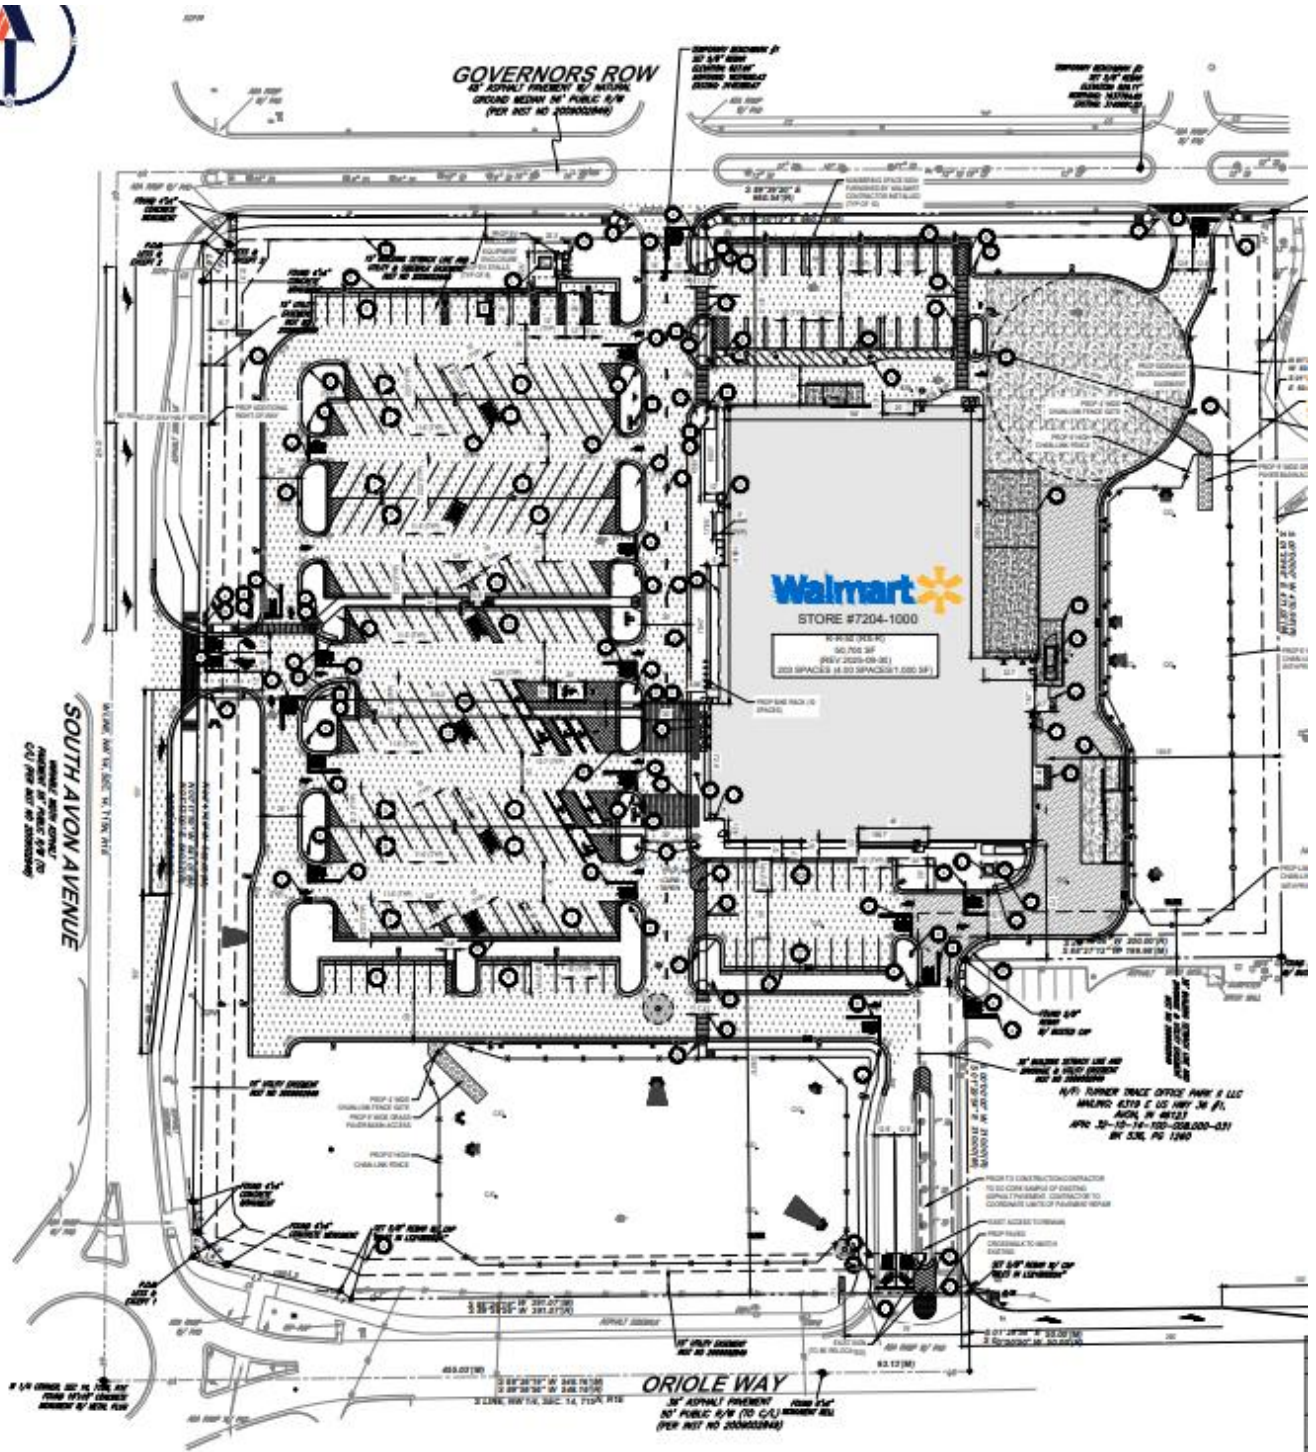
Areas Deficient of Foundation Planting Requirement
